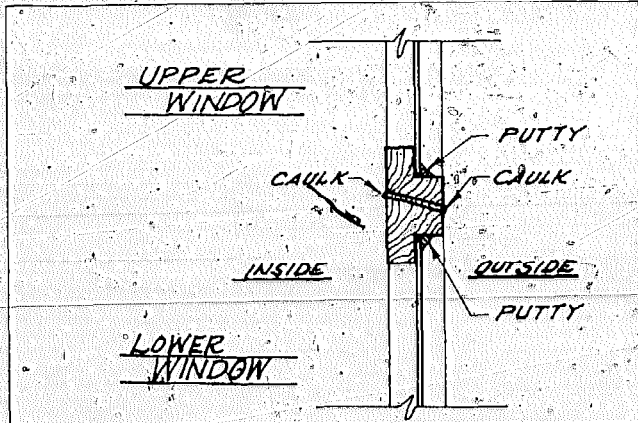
Horizontal joint between two courses of recycled windows
